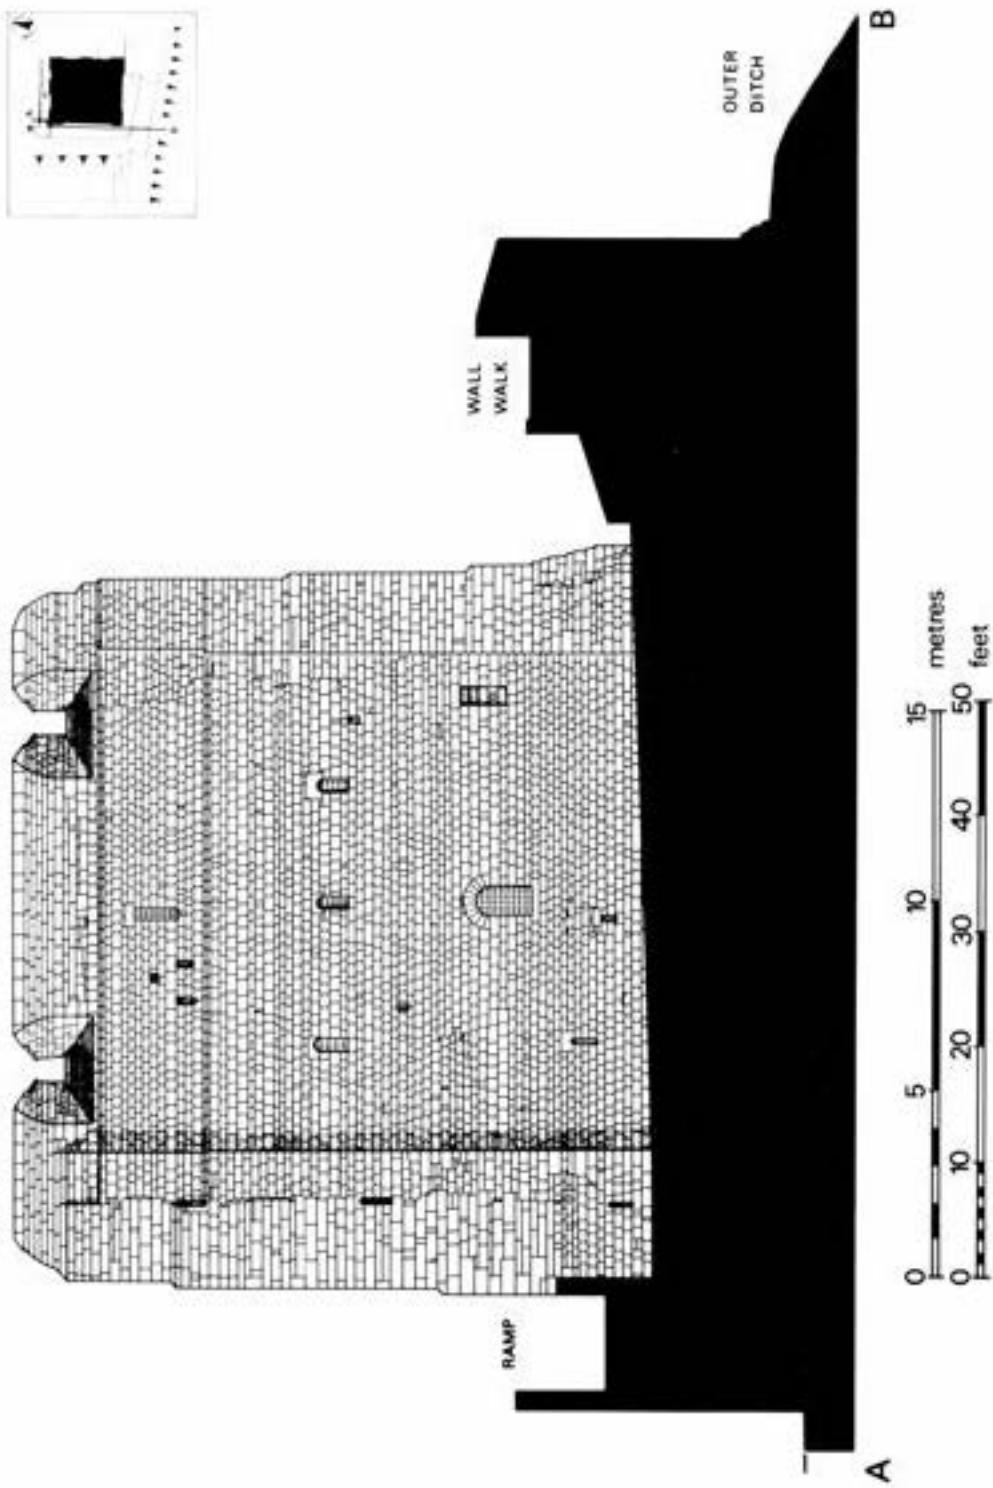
The keep; external elevation of the west wall showing the relationship with the ramp and the south curtain wall
